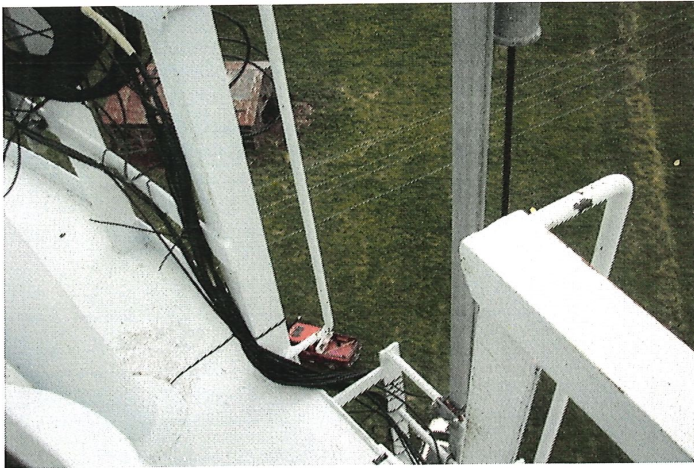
" balcony opening with grab bars. Safety chains should be installed along the opening.
